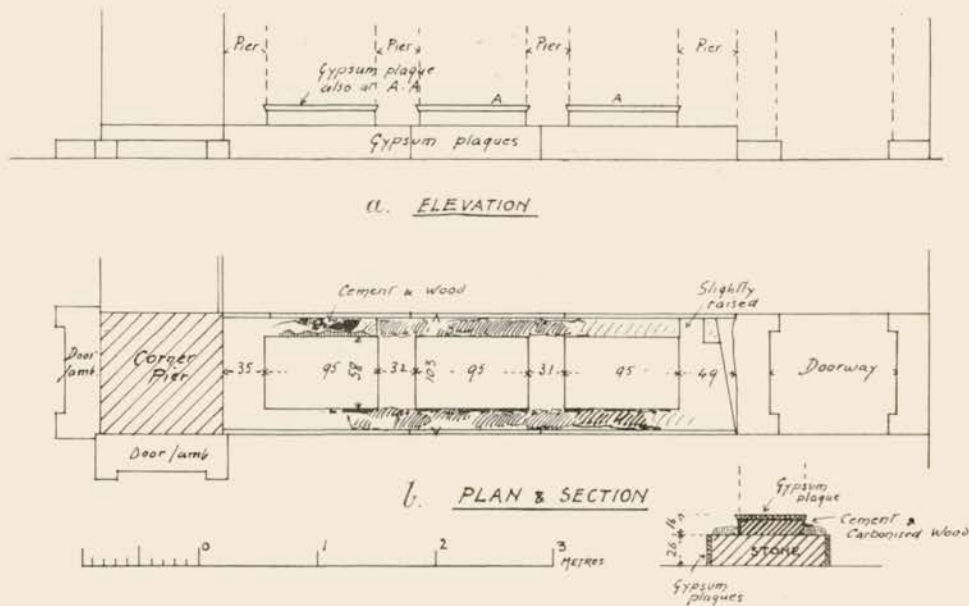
PLAN, SECTION, AND ELEVATION OF RAISED STYLOBATE WITH DOUBLE BENCH.
